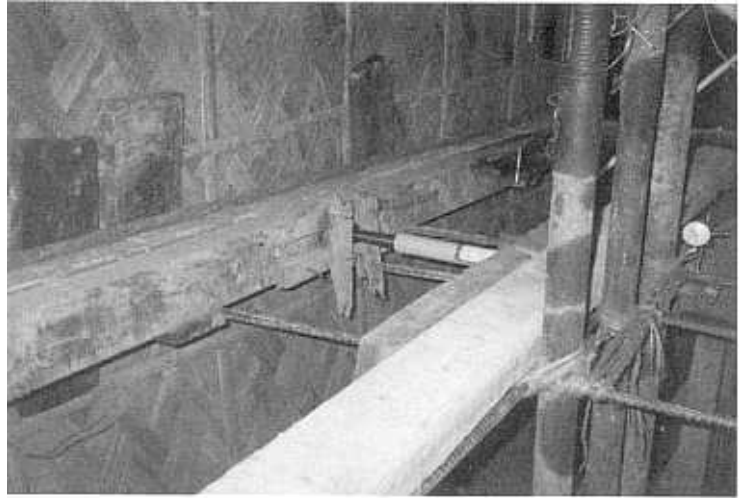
Test Set-Up of Full-Scale Rural House Under Lateral Load
